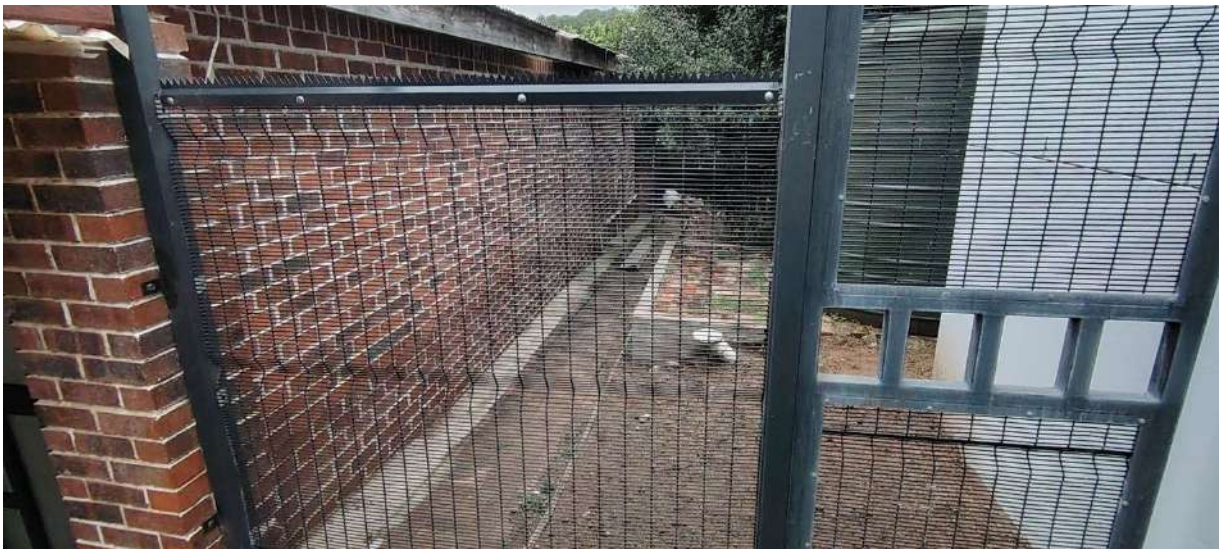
The photo shows the outside wall of the “carport” that encroaches unto the neighbouring Erf 753. The roof-overhang is also visible.
